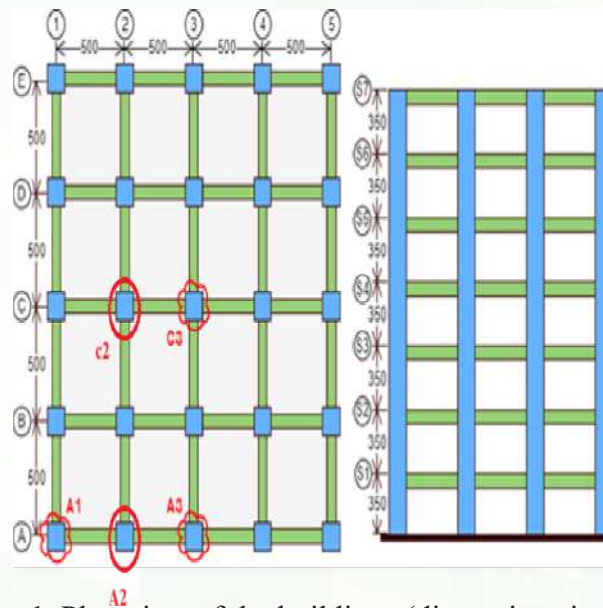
Plan view of the buildings (dimensions in cm) [11]
